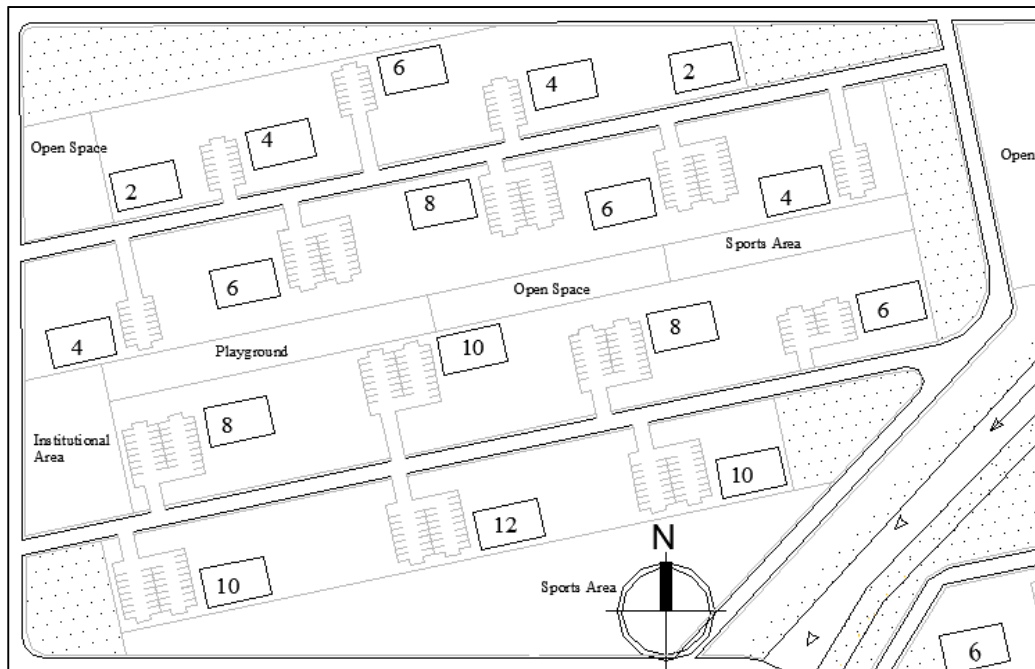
Site plan of solar envelope based alternative (Section 2).
